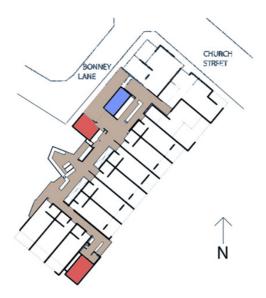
Case 6 Typical Floor Plan Source: Diagram by R. Callinan, QUT
